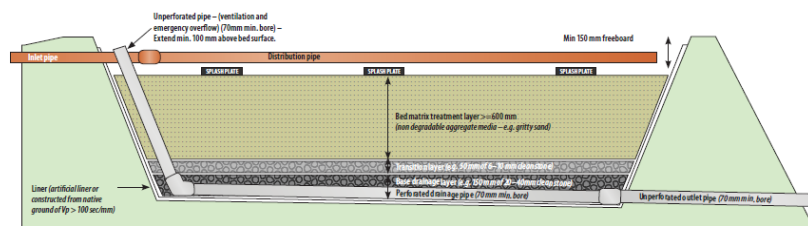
Typical longitudinal section through a vertical flow constructed wetland prior to planting
